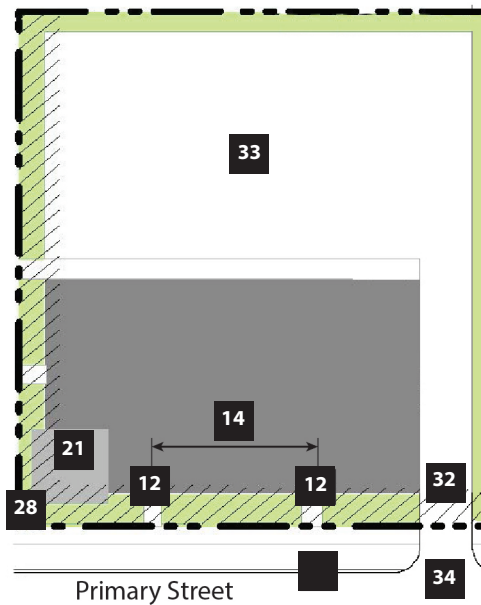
General building siting diagram shown with corner tower and rear vehicular access. Not to scale.
